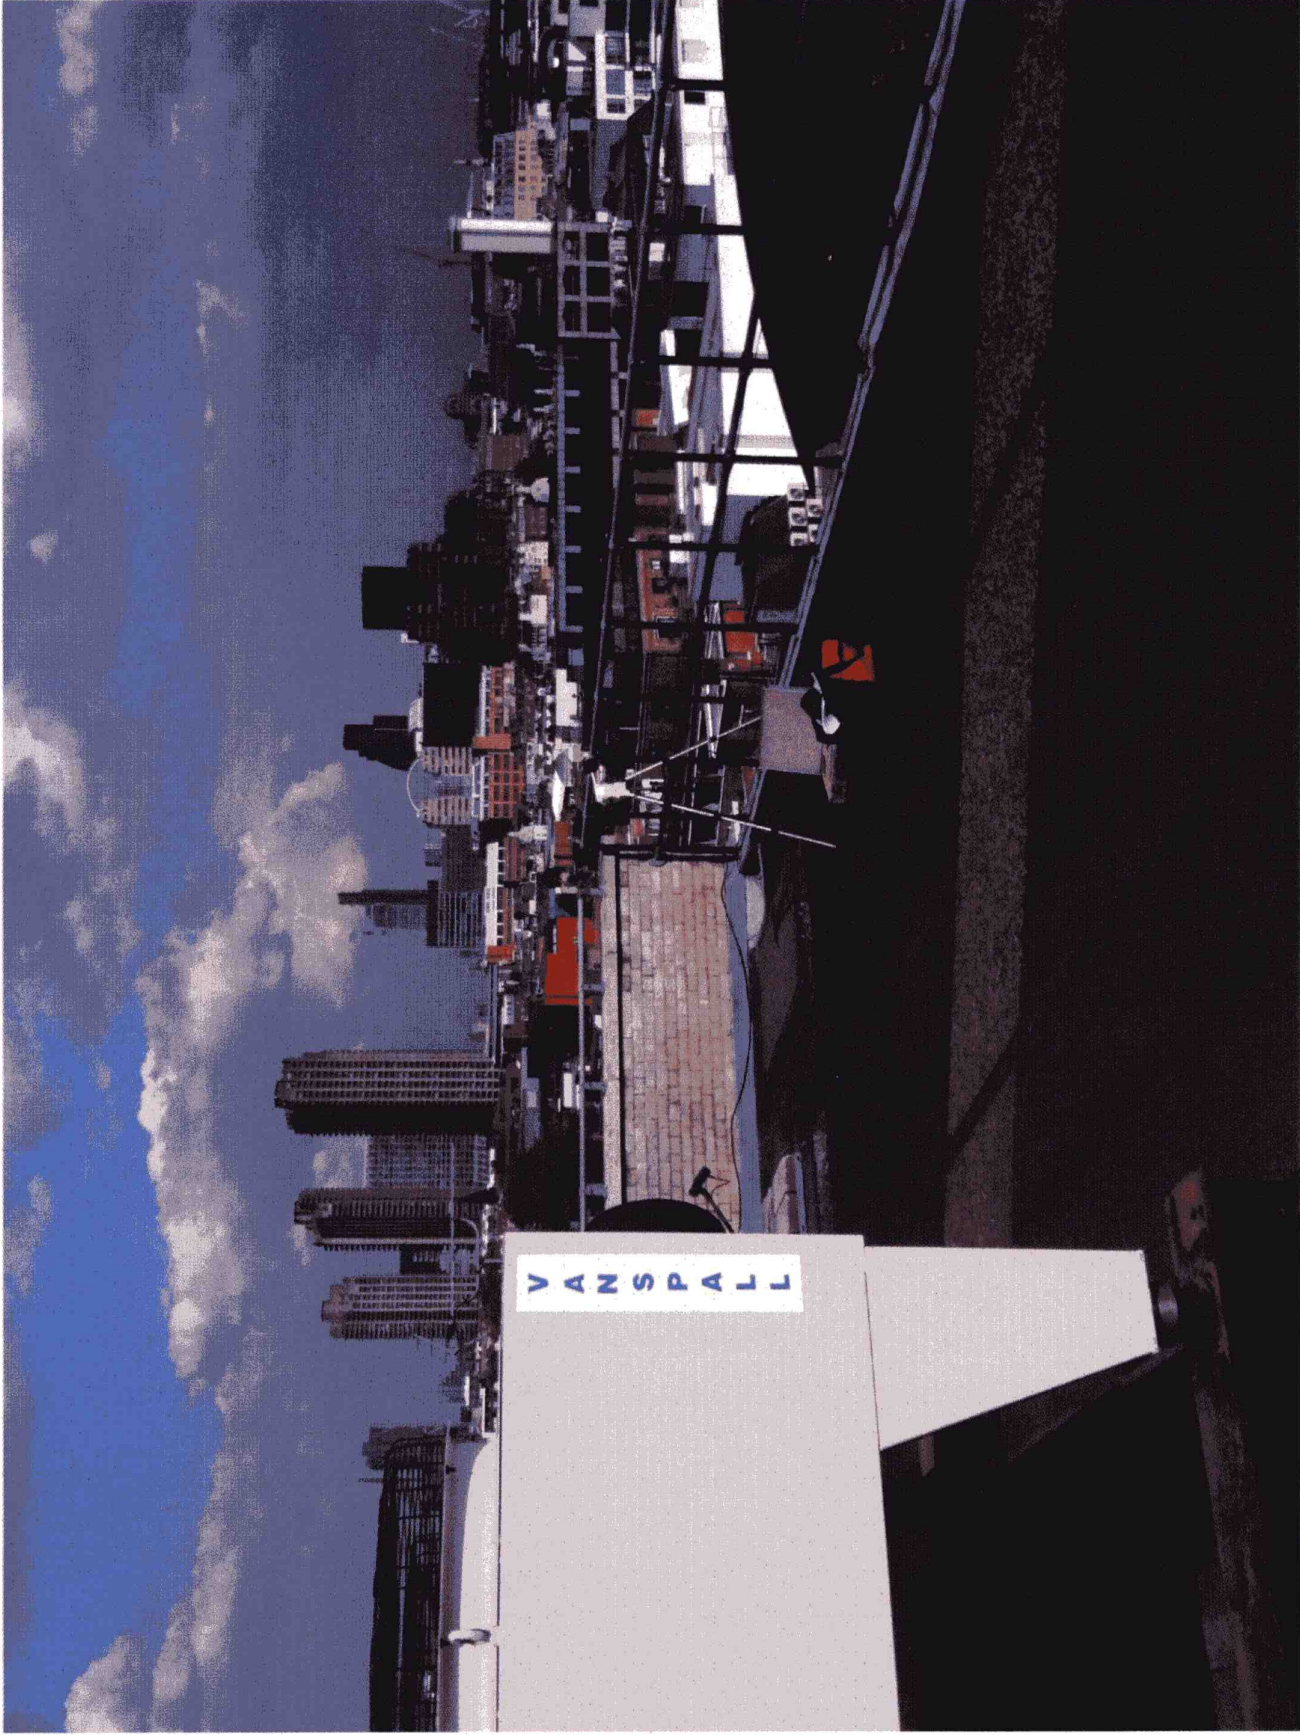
PHOTO B: Microphone location adjacent to railings and showing location of existing condenser unit behind.
